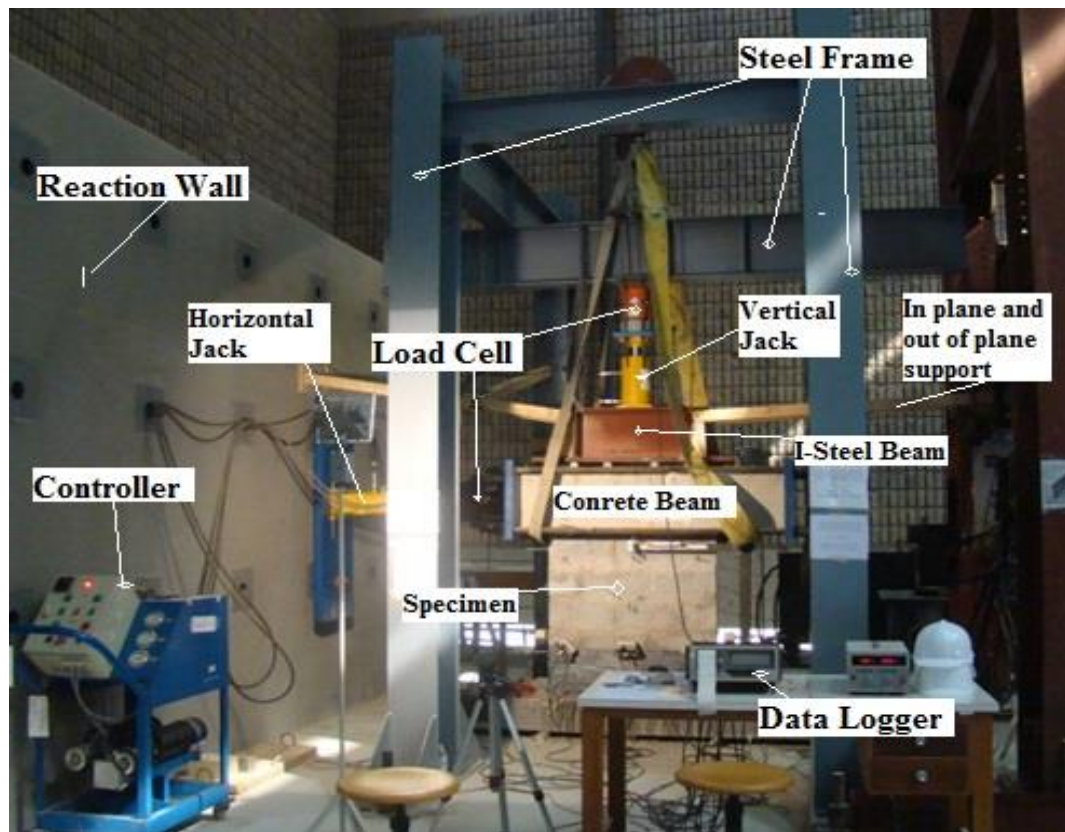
Photo of the URM Wall Cyclic Test Laboratory Set-up
